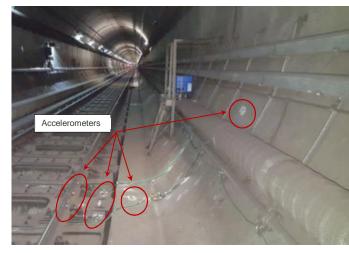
Vibration transducer installation at a single tunnel cross-section (Ch5039)
